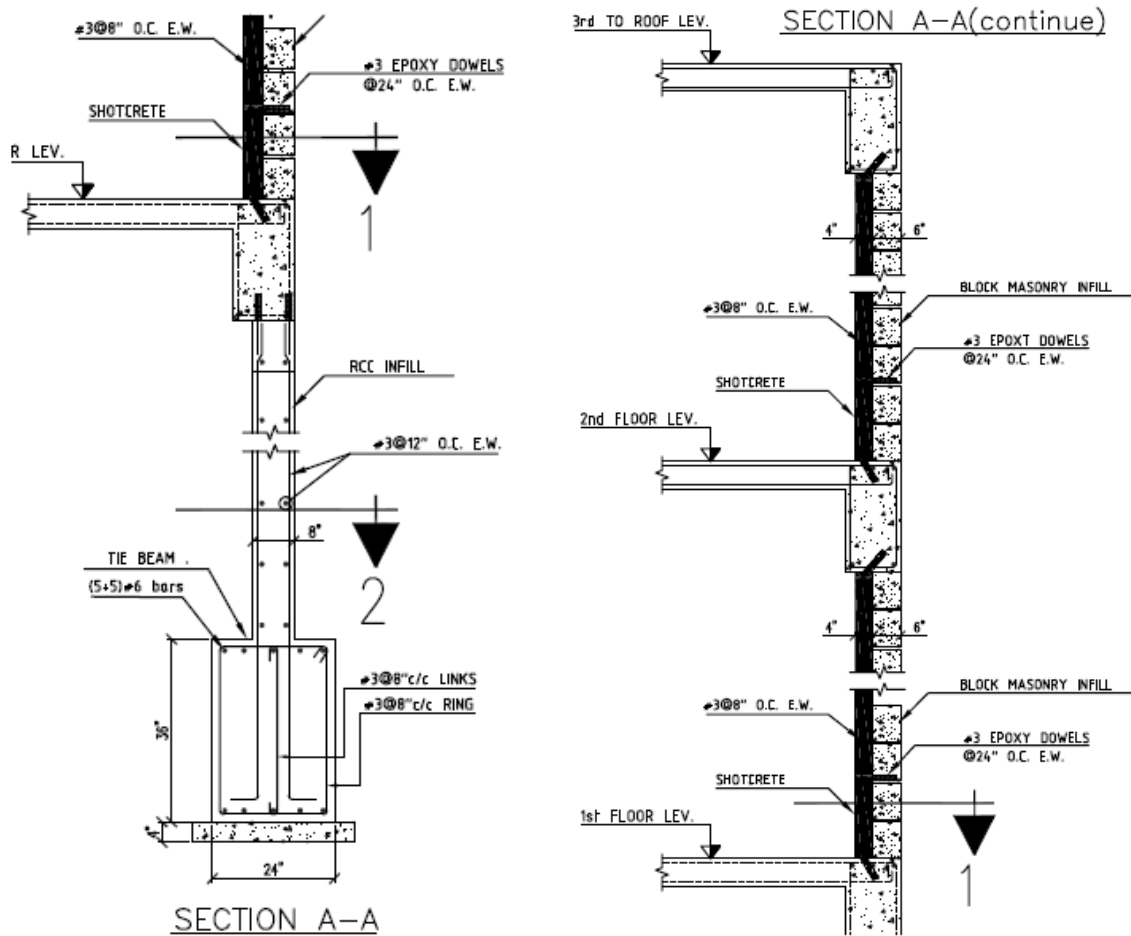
Vertical section showing connection of spine to existing beams and new tie beam
